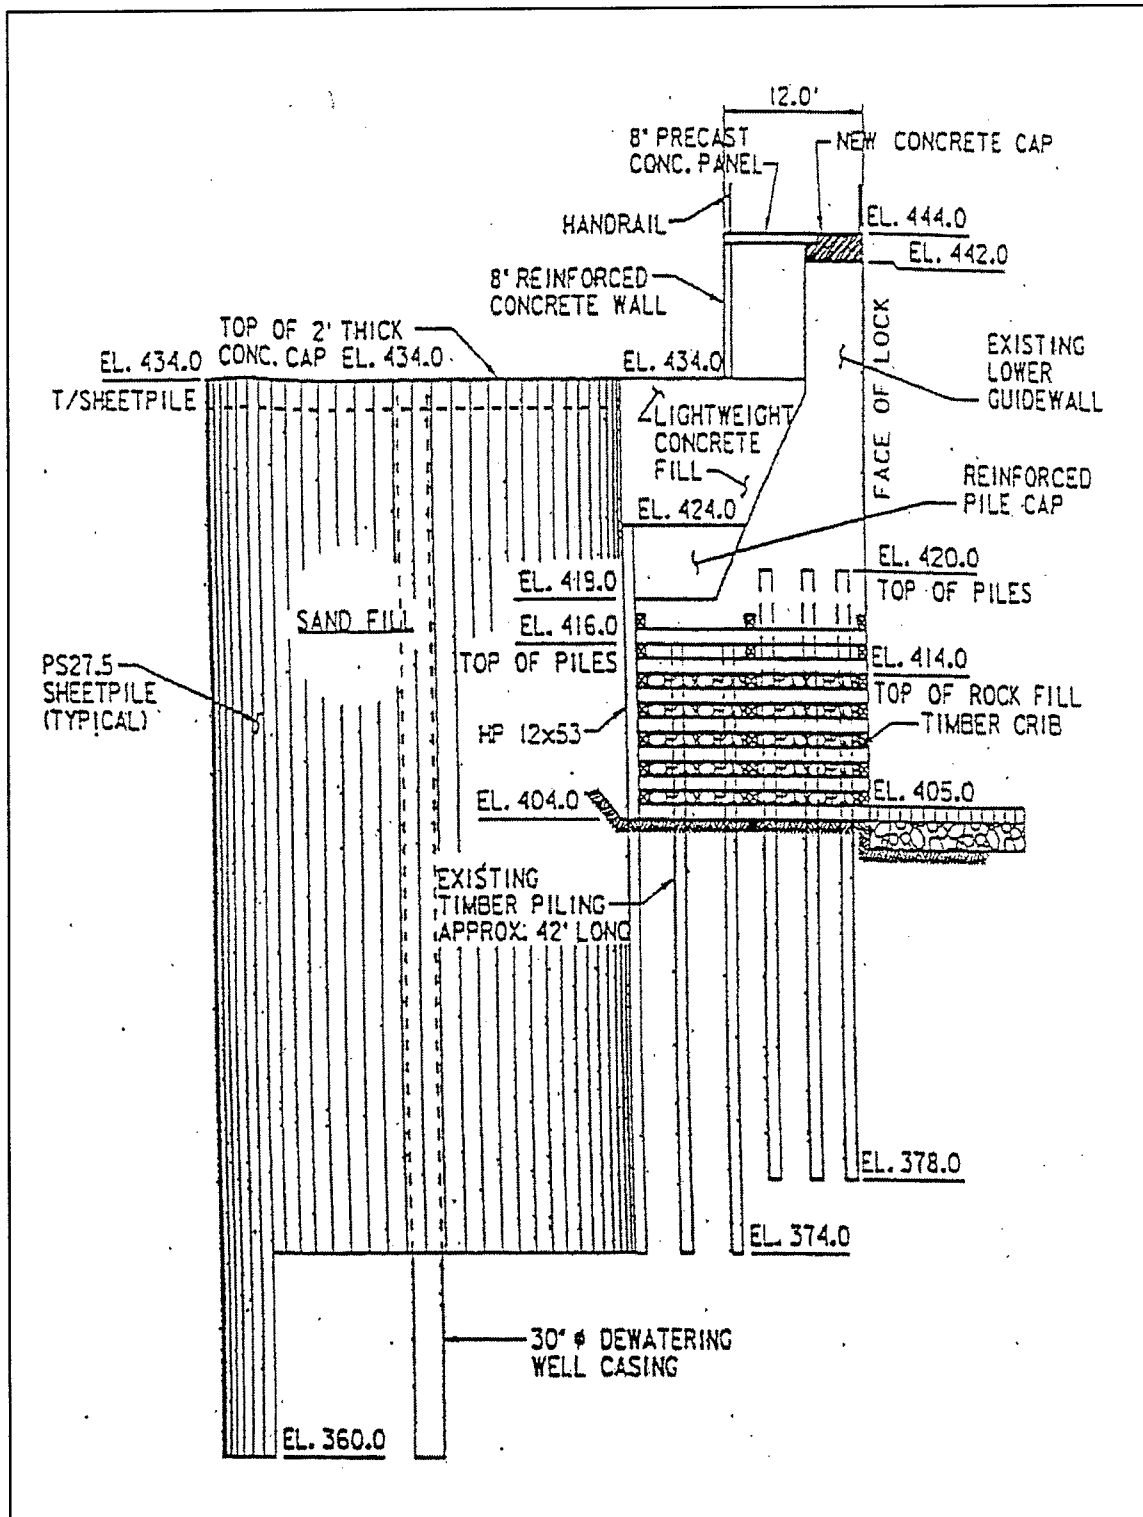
Plan 1, sheet-pile cells used to support existing guide wall
